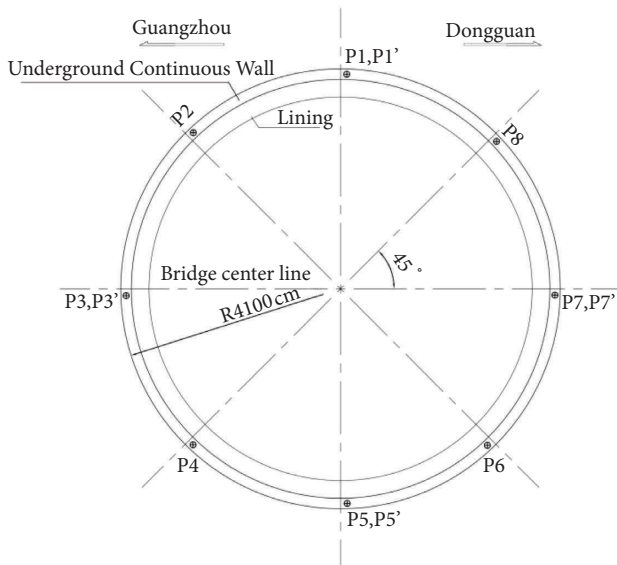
Deep deformation monitoring points for the diaphragm wall.
